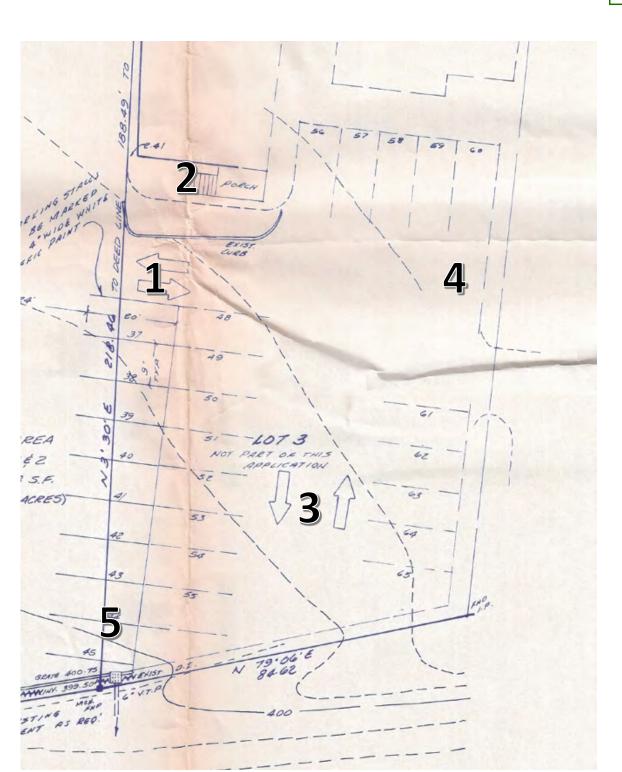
Conditions of faulty arrangement observed, as mapped on the approved Site Plan.
